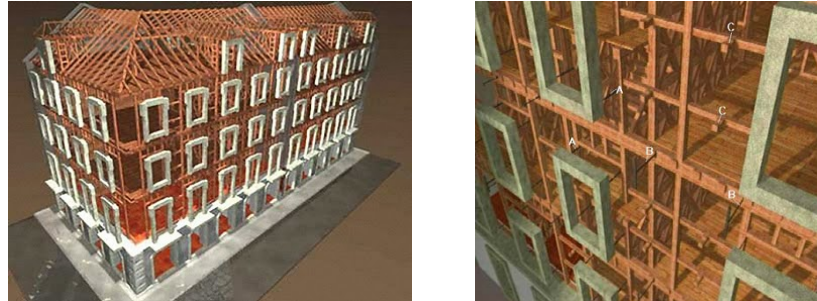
Model of the timber frame on the façade walls (Silva, 2007).
